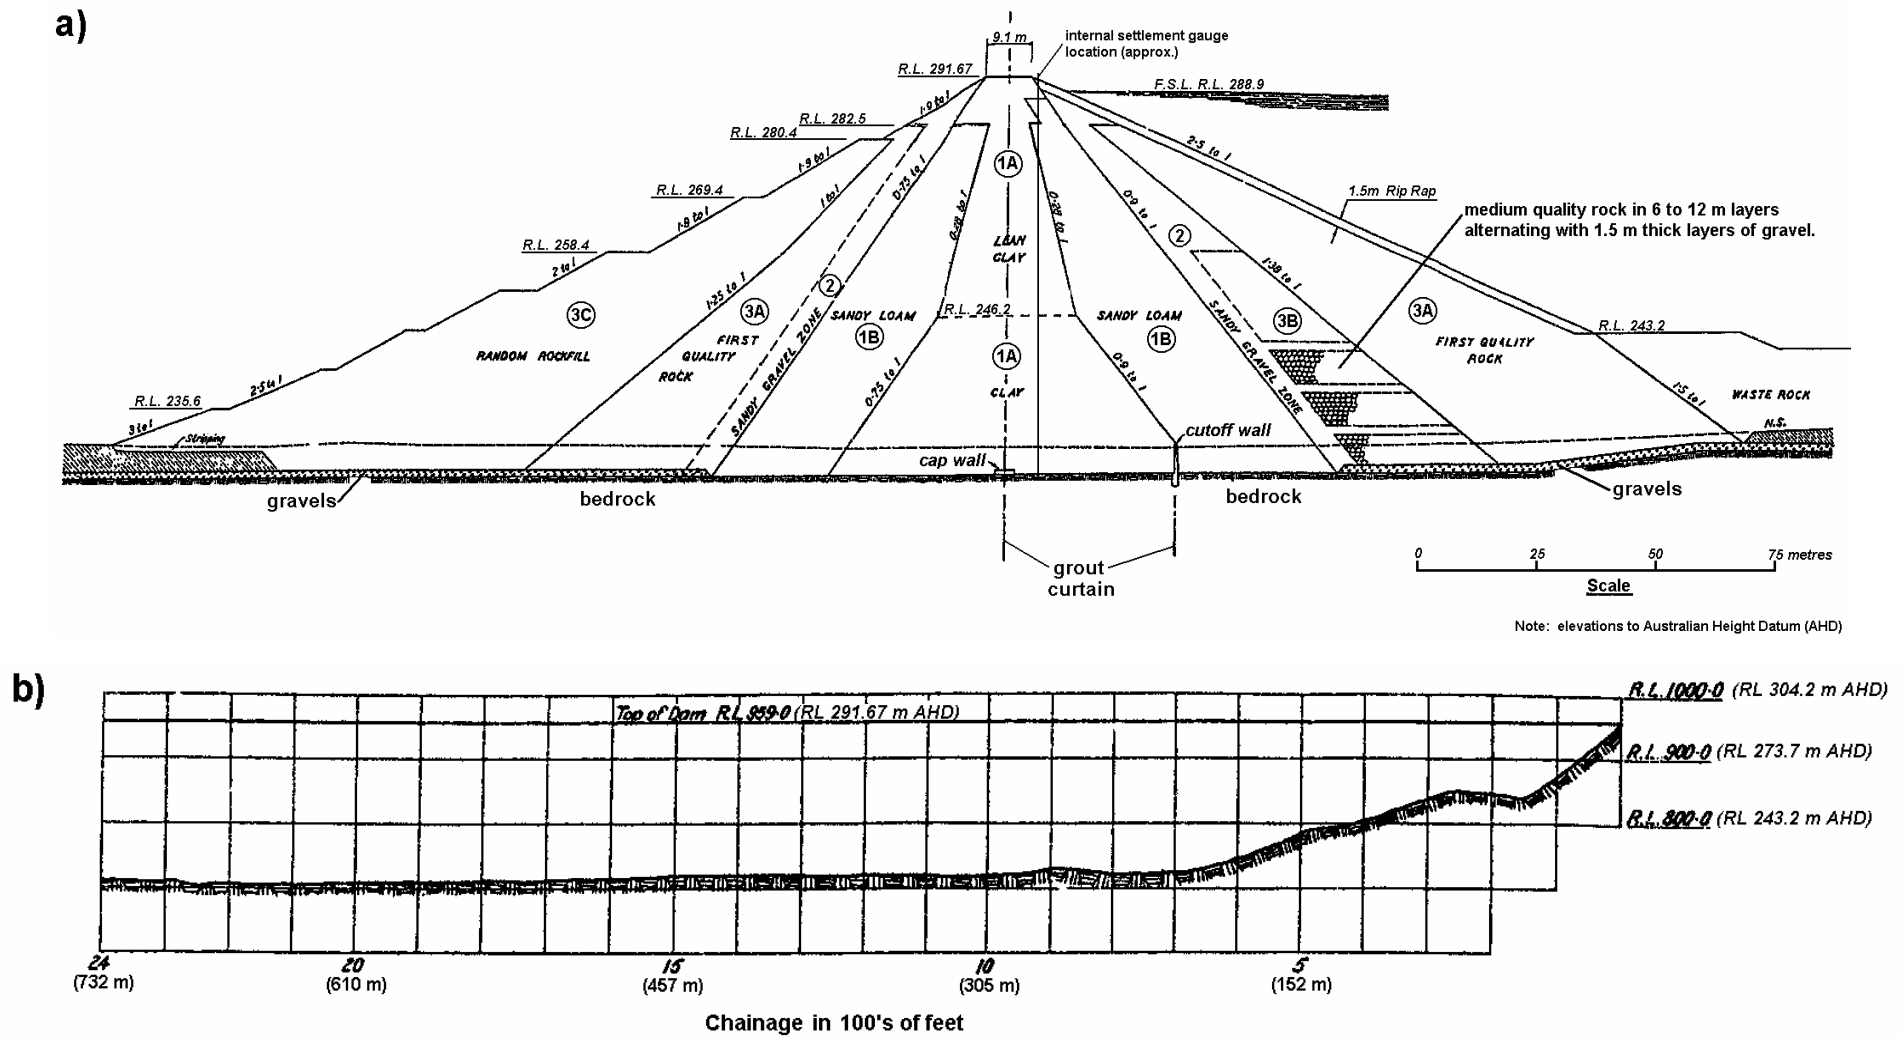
Eildon dam, (a) main section and (b) longitudinal section (courtesy of Goulburn Murray Water).
